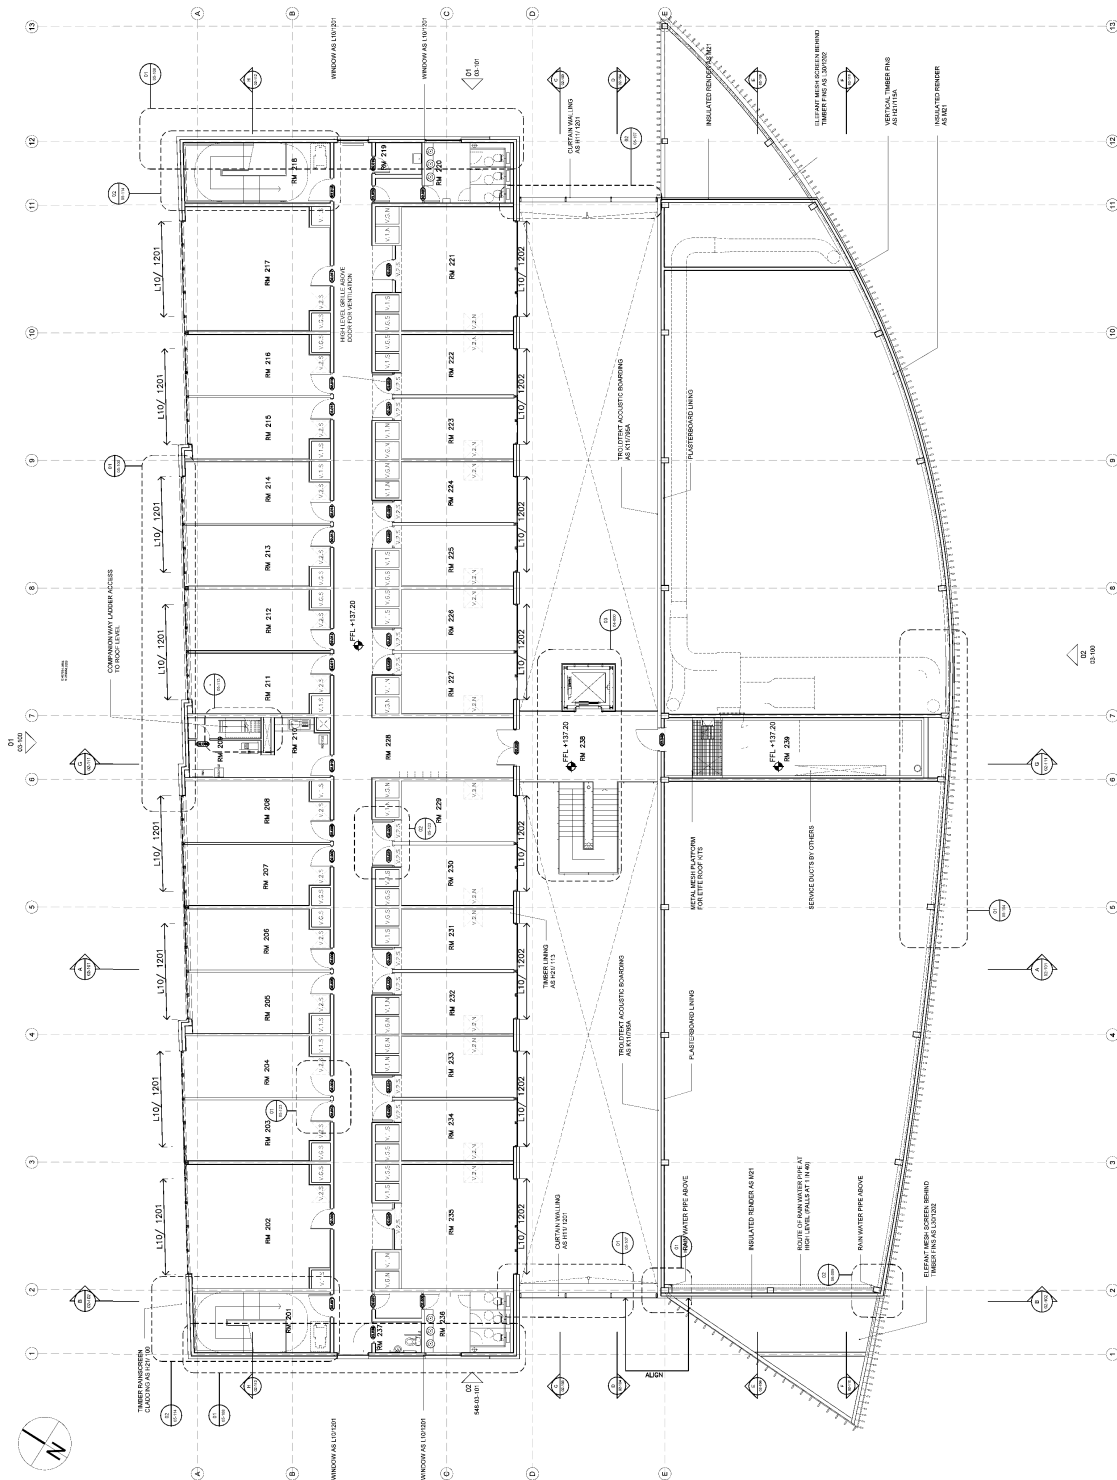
Second Floor Plan (Consarc, 2011)
